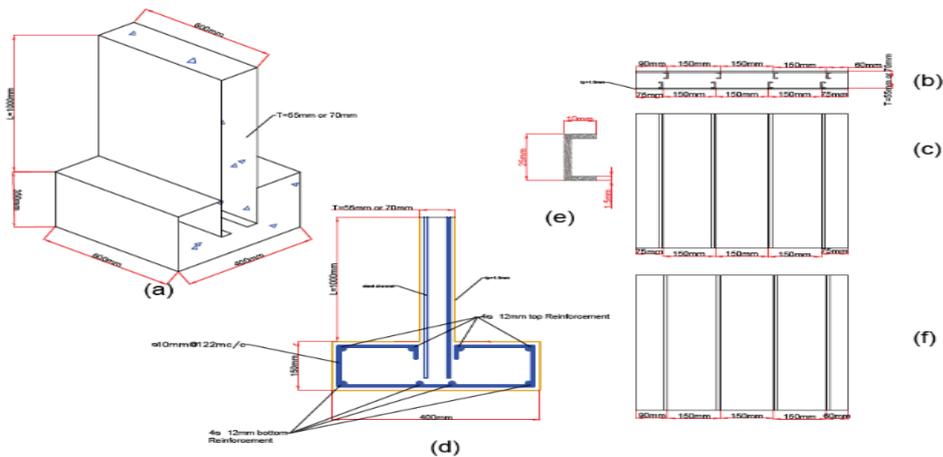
Details of all groups (a) isometric view of wall (b) top of the wall (c) right plate with steel channel (d) section through all wall (e) dimension of steel channel (f) left plate with steel channel
